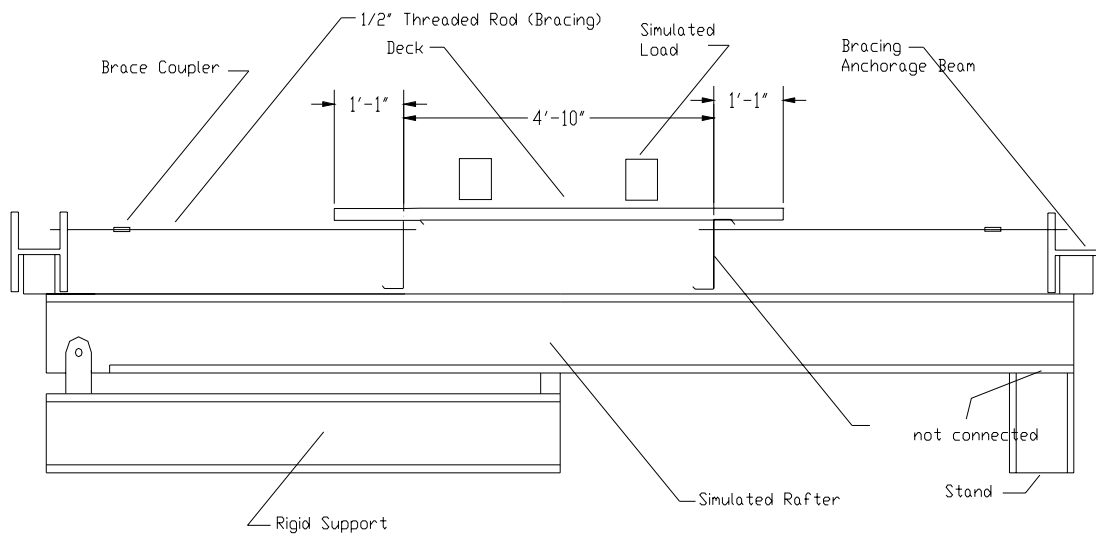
Typical Rafter Support Used for 2 Purlin Line Tests
